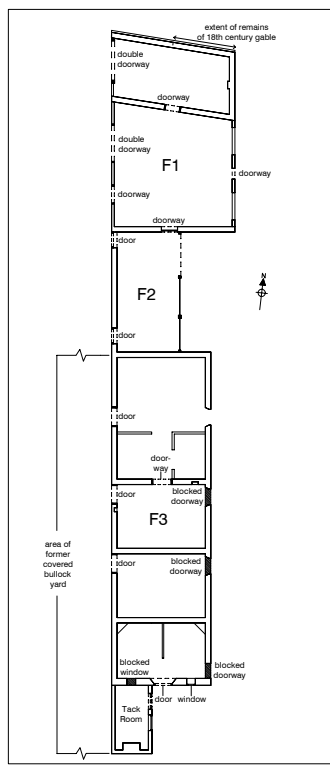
Plan of Stables and Tack Room (Building F). Scale 1:200
